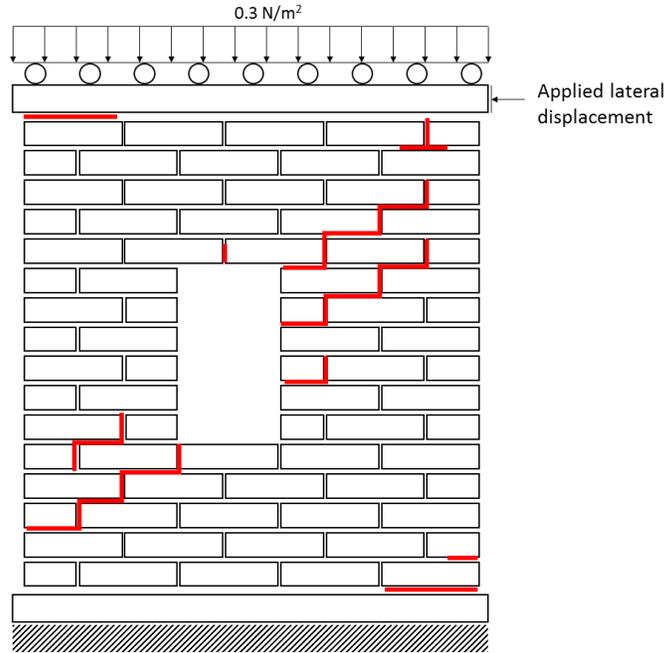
Crack patterns at 4mm of laterally applied displacement for FE model of shear wall with an opening
